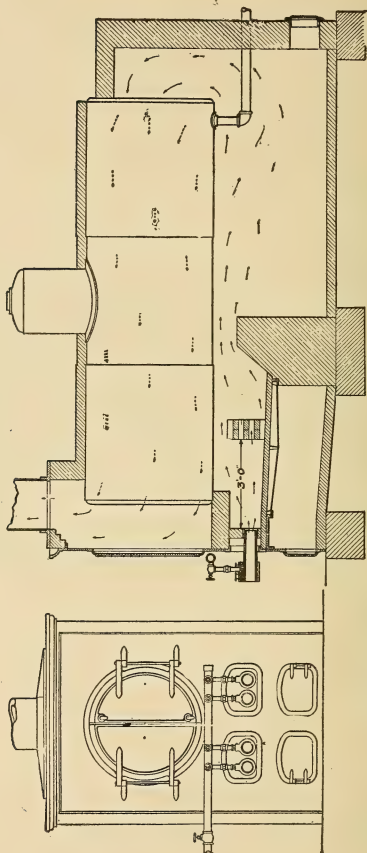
GWYNN BURNERS APPLIED TO HORIZONTAL TUBULAR BOILER
